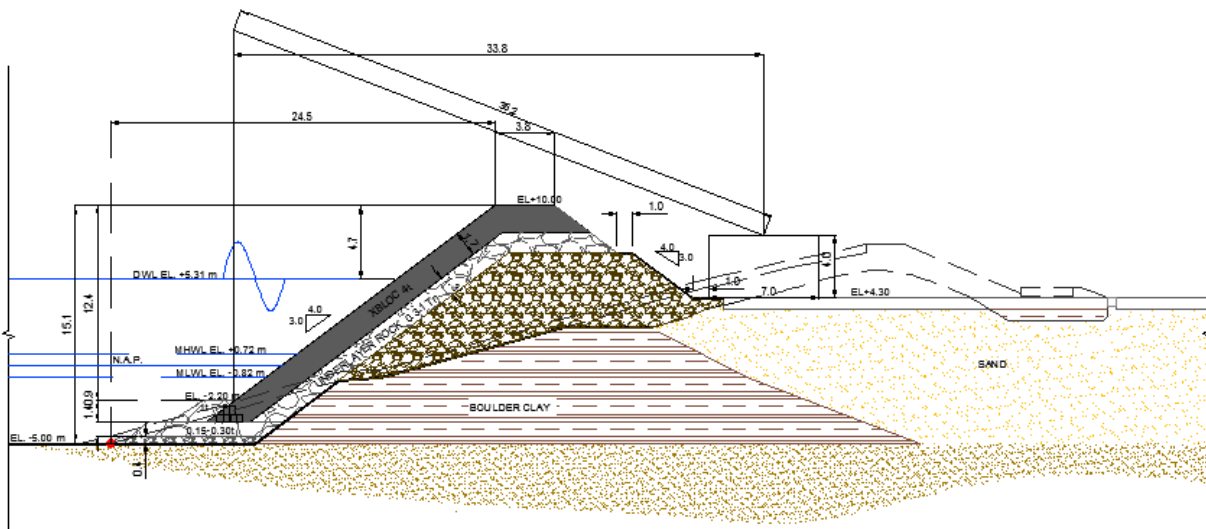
b. Cross Section Xbloc® without crown wall. Crane operations.
